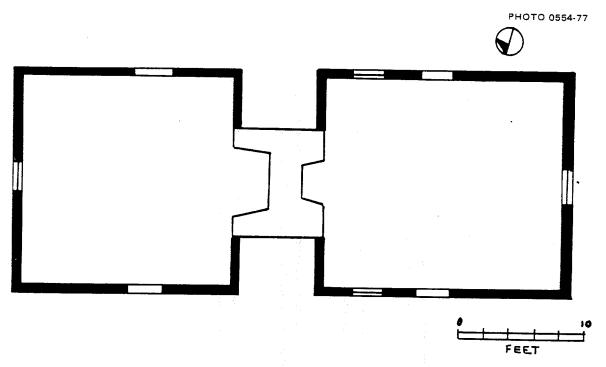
Ground Floor Plan, Freels Cabin (Structure 640A).
